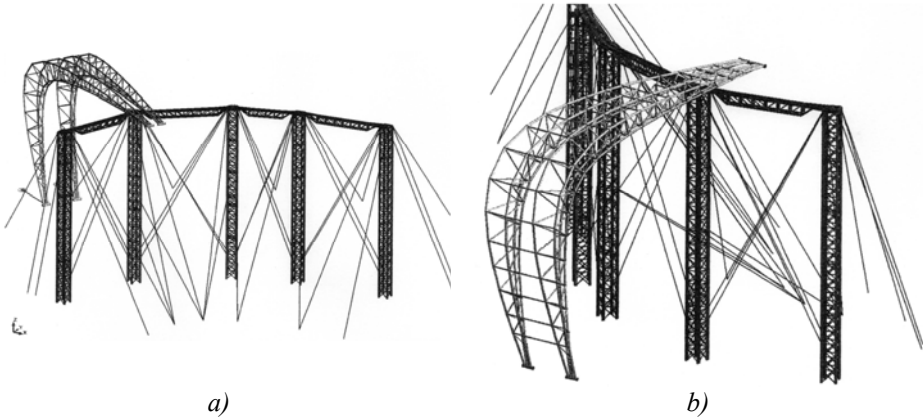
Diagram showing a “roof” girder resting on the supporting lattice beams, the girder immediately after assembling, two adjacent girders linked with circumferential bars prior to the mounting of the next girder
